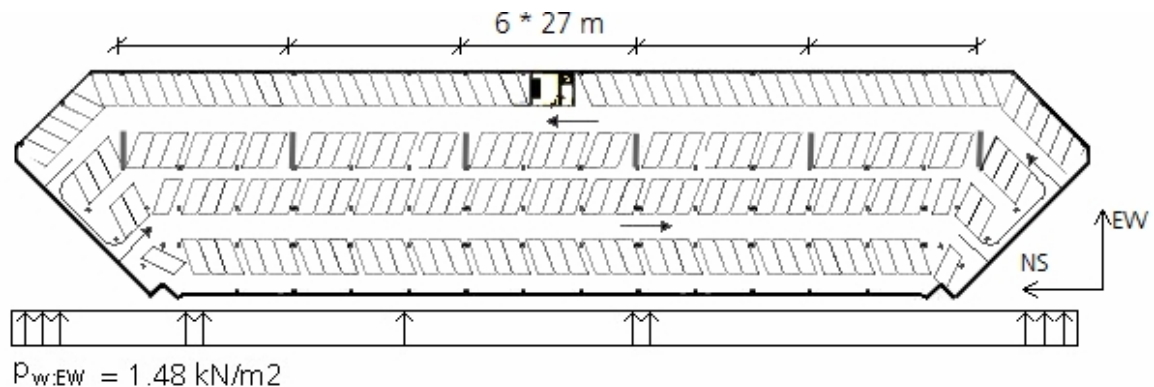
Proposed location of the small shear walls (c.t.c. about 27 m)
